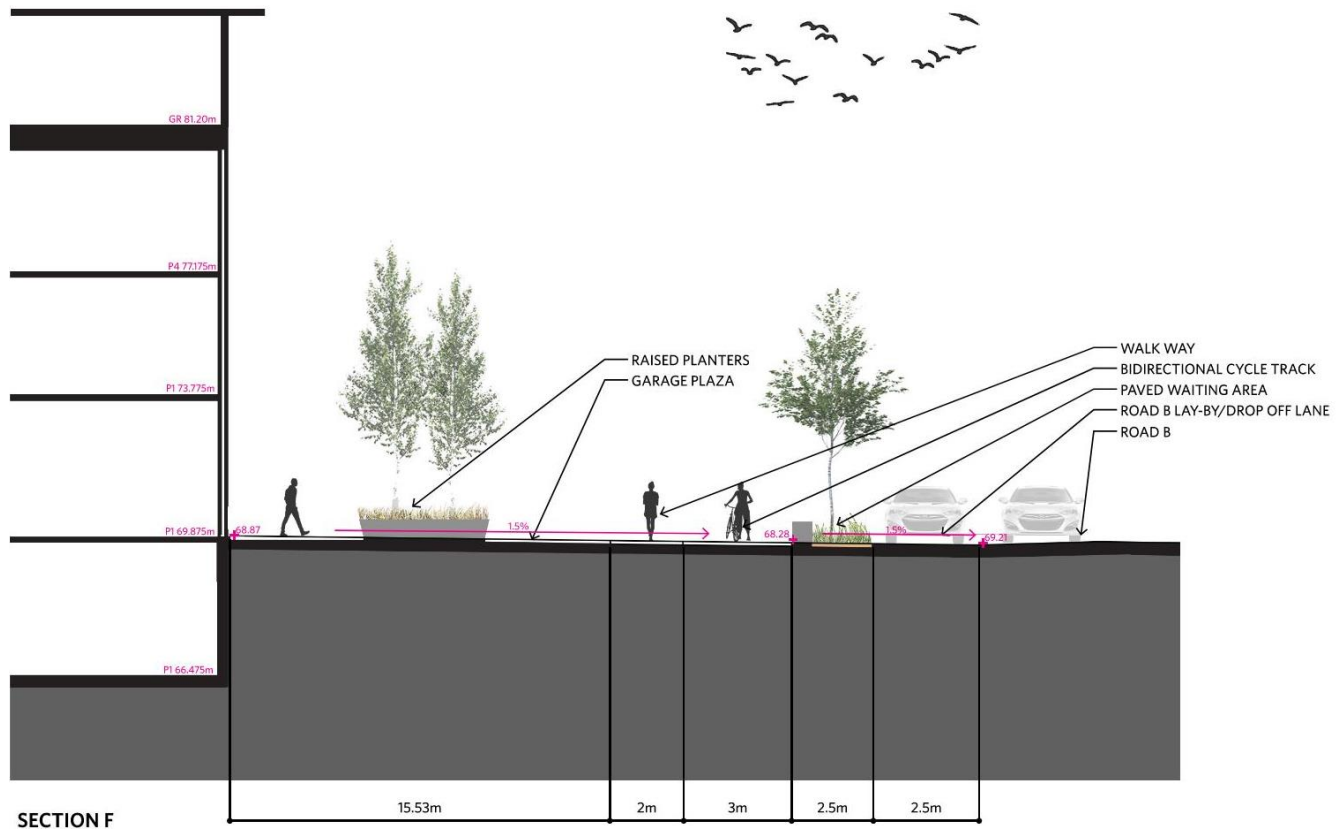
illustrates the Road B pedestrian and entry plaza adjacent to the garage's vertical Beacon, as described below. As with Road A, vehicular, pedestrian and bike access to the garage is on Level P2. A gently sloping plaza pavement is interspersed with raised planting beds and seatwalls.
